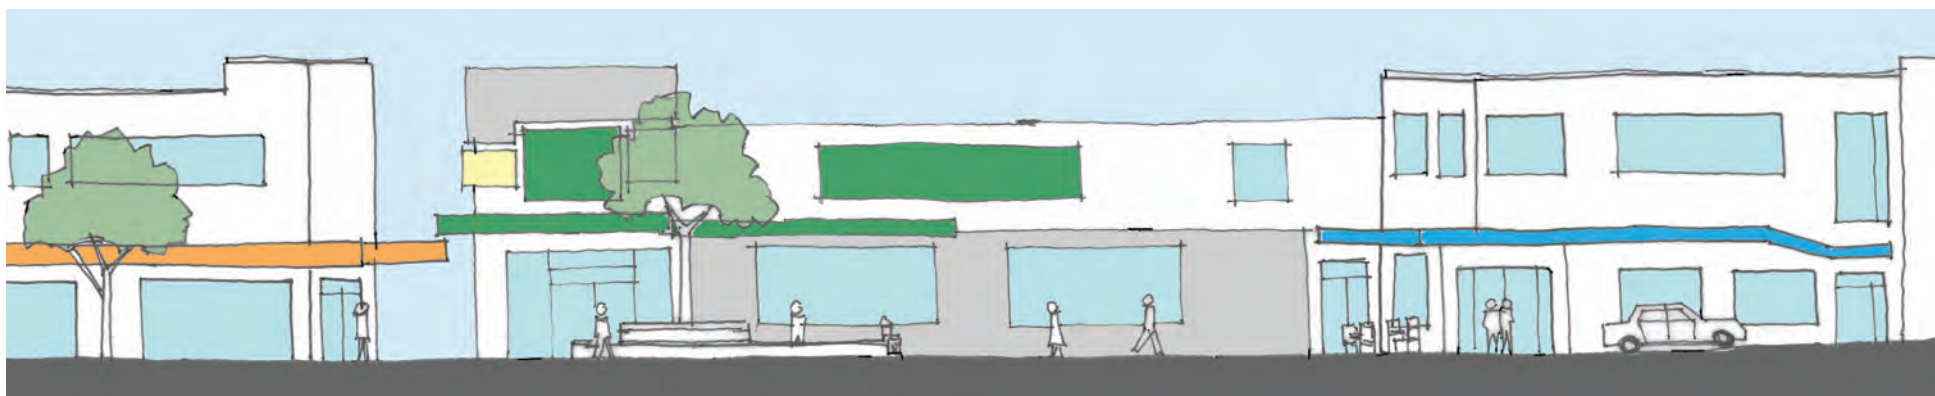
Elevation of Preferred Building Frontage Outcomes in Precinct 1
